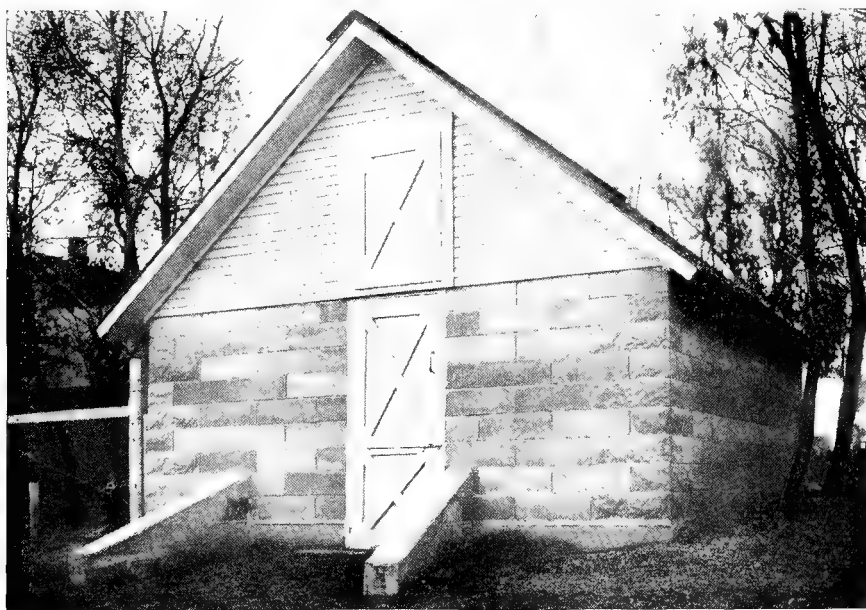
Concrete Block Ice House, Echo Valley Farm, Henry Hanson, proprietor, Odeboldt, Iowa. Built in 1907 by the owner. Size, 16 feet by 24 feet.
